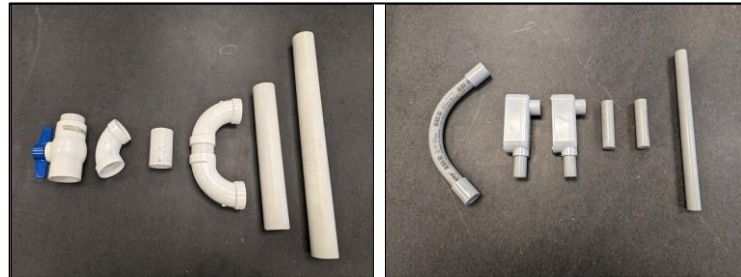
PVC Pipe Pieces and Electrical Conduits for Panel 1
